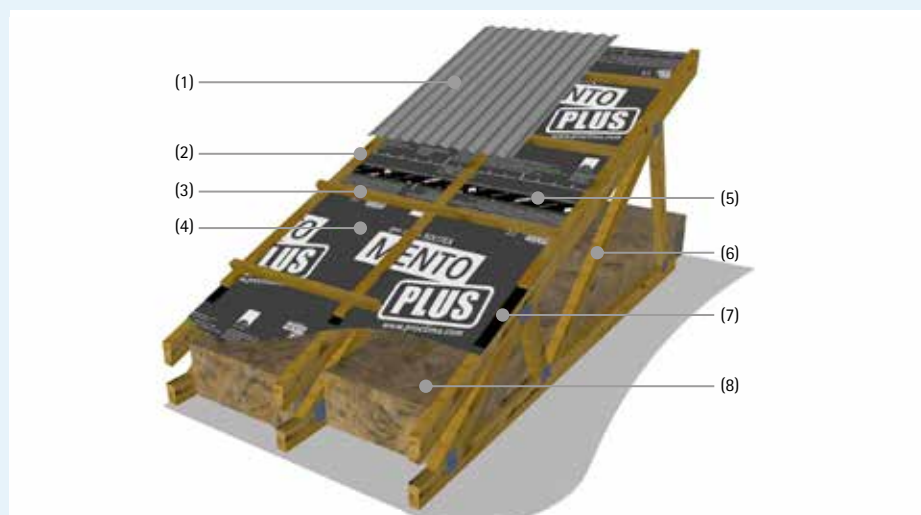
The ventilation arrangement for a typical truss roof is the same as for a skillion roof. A ventilated cavity is created between the roof cladding and the membrane by battens and counter battens. The insulation is still protected by the membrane above, but with a void between them. *Specific products may vary. (1) Roof sheeting (medium colour), (2) Counter batten, (3) Fixing batten, (4) SOLITEX MENTO®, (5) TESCOX EXTORA® (Weathertight sealing tape), (6) Roof truss, (7) TESCOX® NAIDECK (Double sided self-sealing strip), (8) Fibrous insulation
